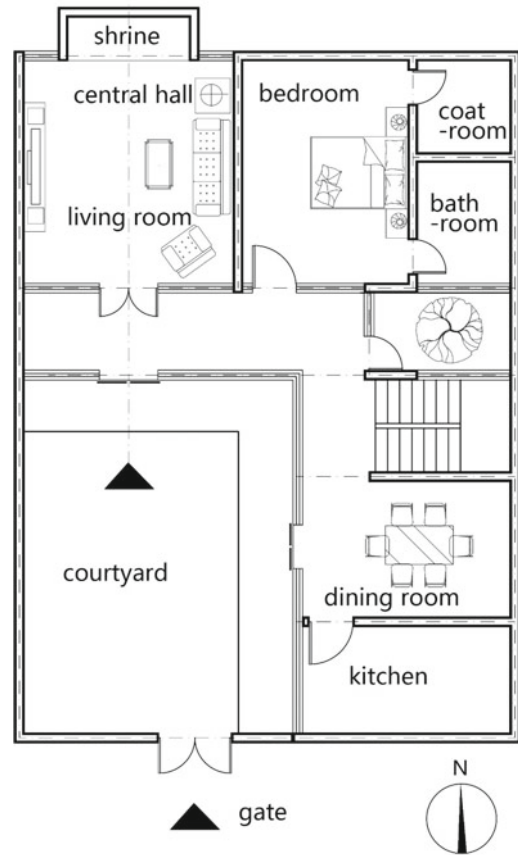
The plan of our design incorporating spatial model of traditional central hall layout (drawn by author in 2022)
